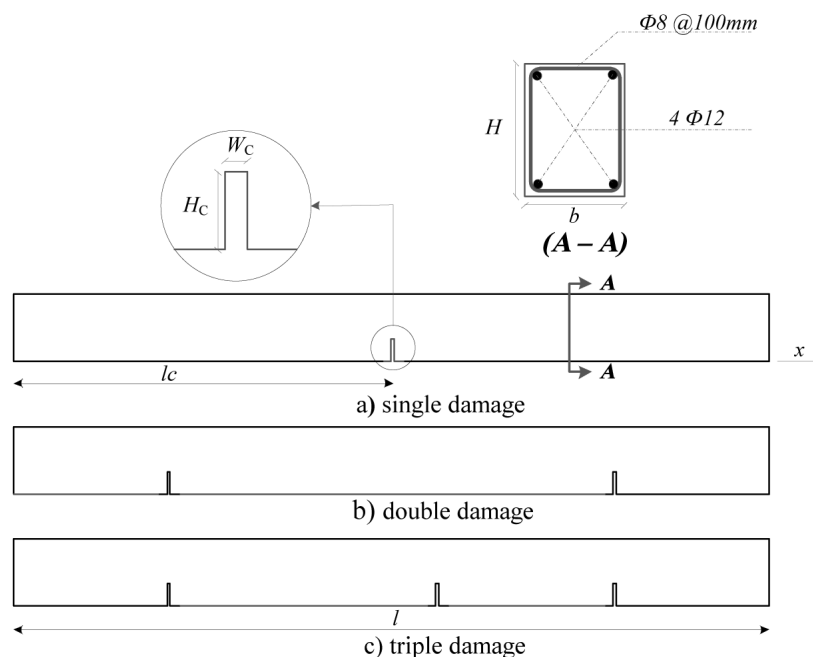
Model of damaged reinforced concrete beam: a) single, b) double and c) triple damage scenario
